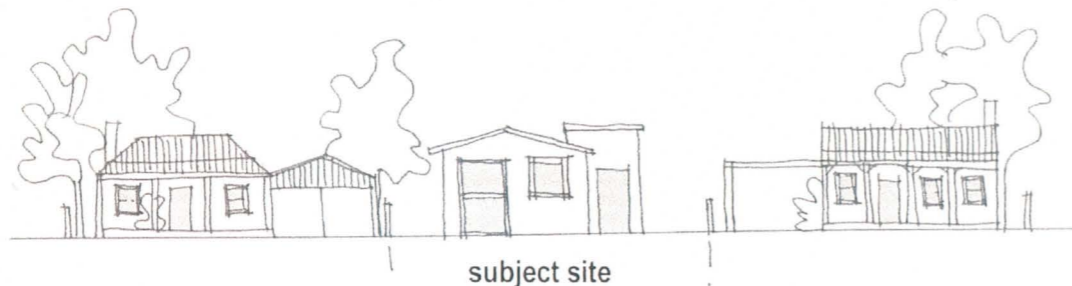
Bad example of infill, with inappropriate roof form and placement of openings.
